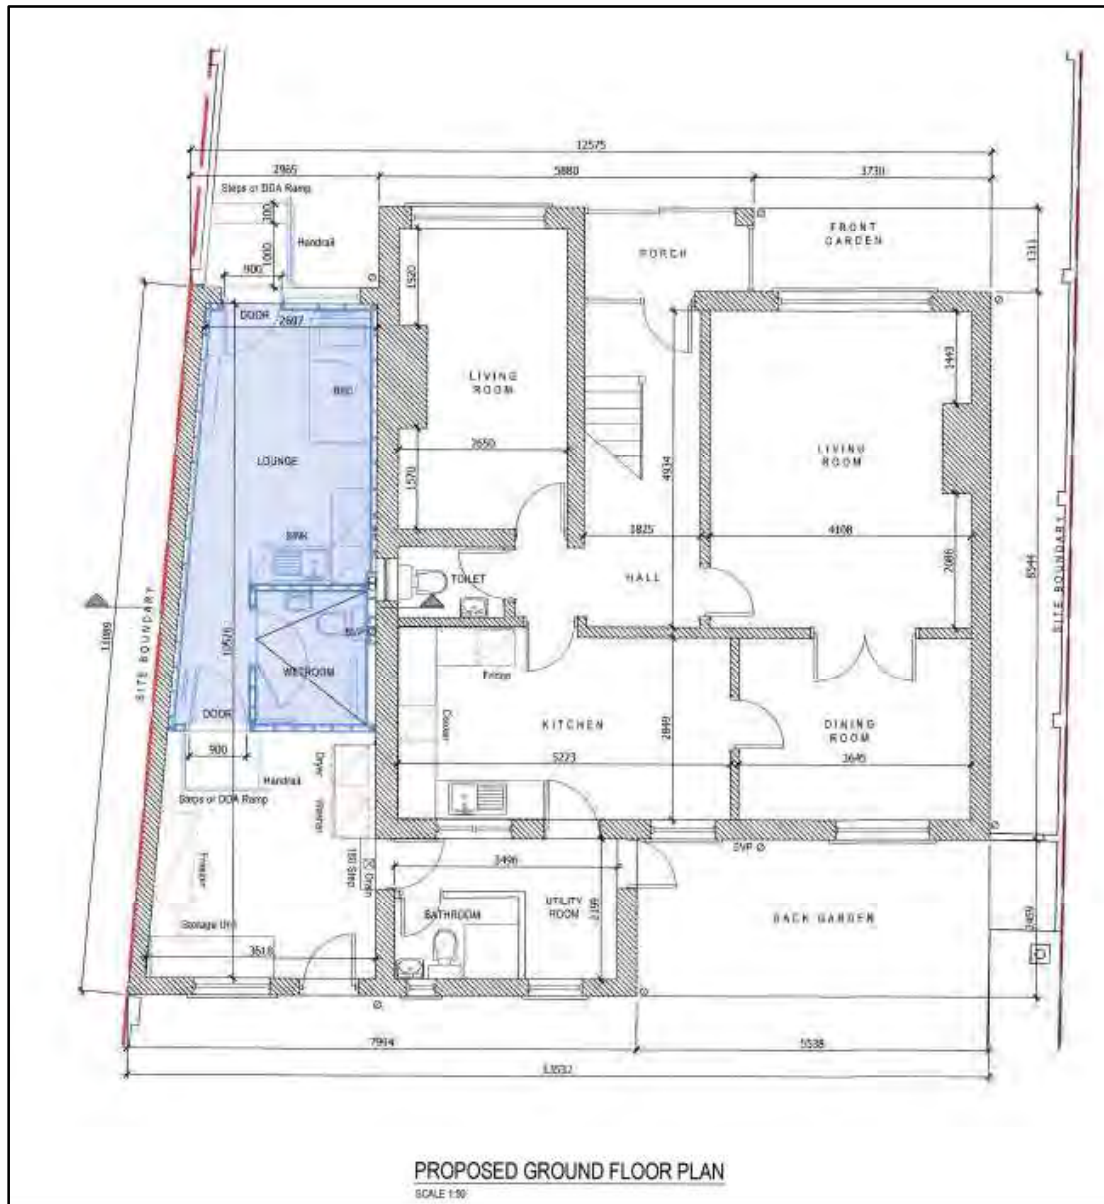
Plan of site showing new living space in blue with access ramp at front of the building.
